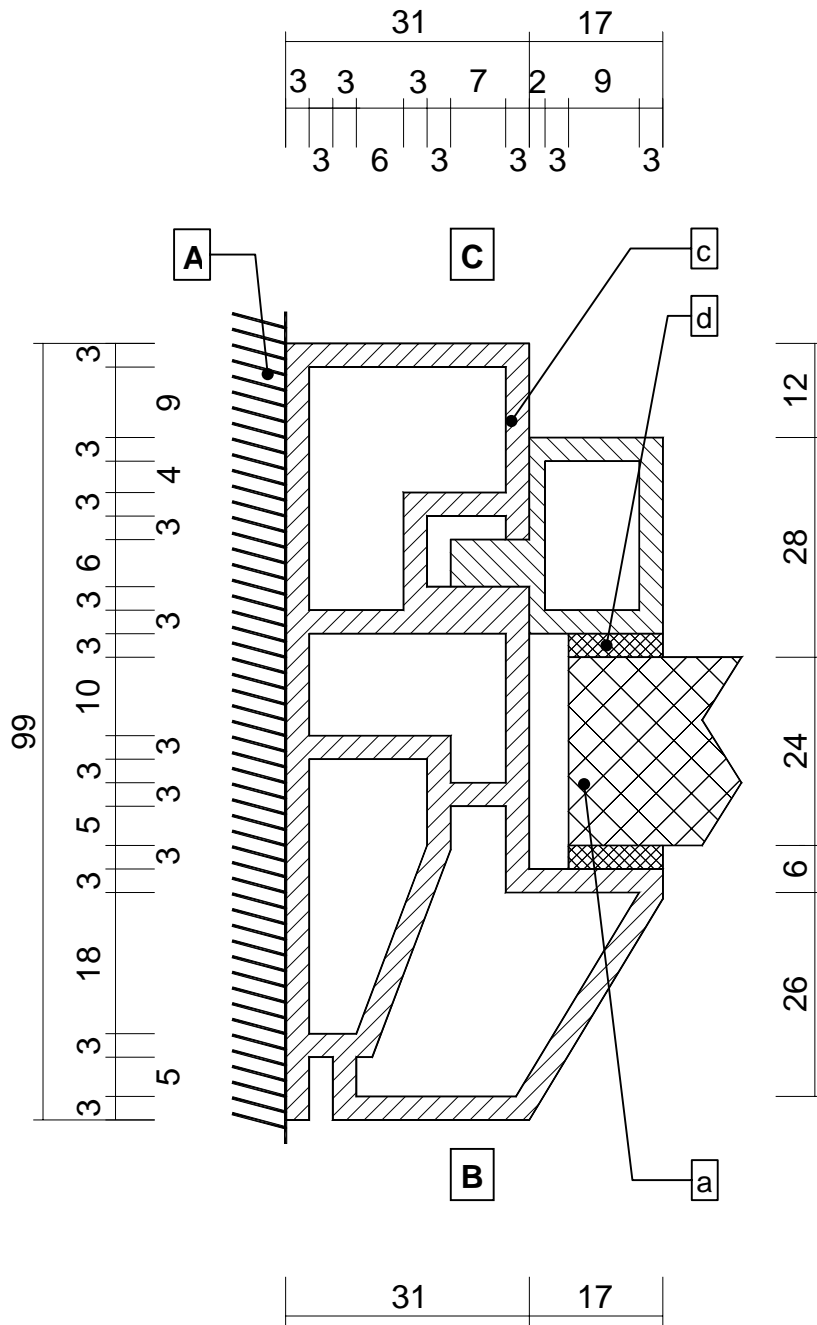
Fixed frame section and insulation panel ($b_f = 48$ mm)
